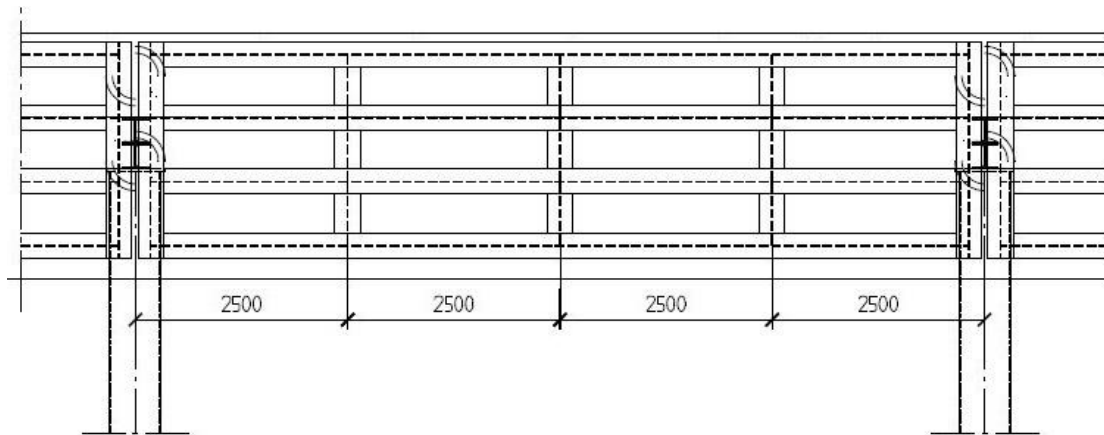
Protective pier front view showing the spacing of pile groups.
